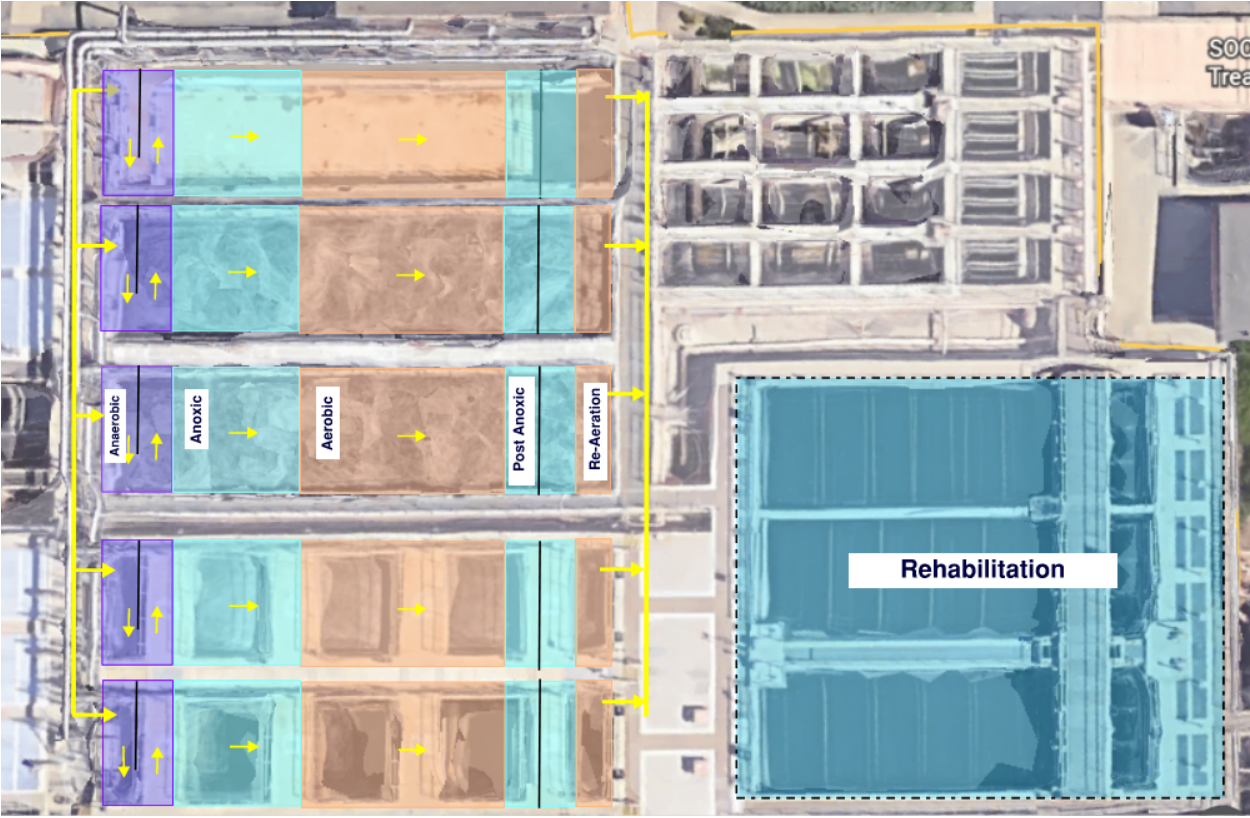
Five-Stage BNR Alternative Conceptual Layout
